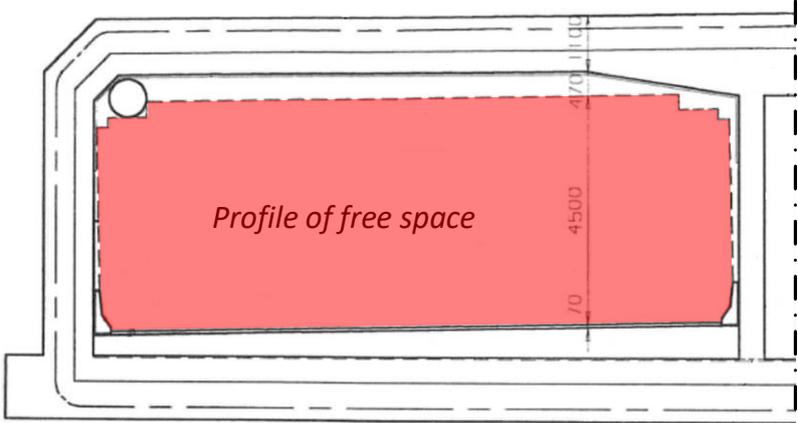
, WIJKERTUNNEL PROFILE OF FREE SPACE; CROSS-SECTION VIEW
